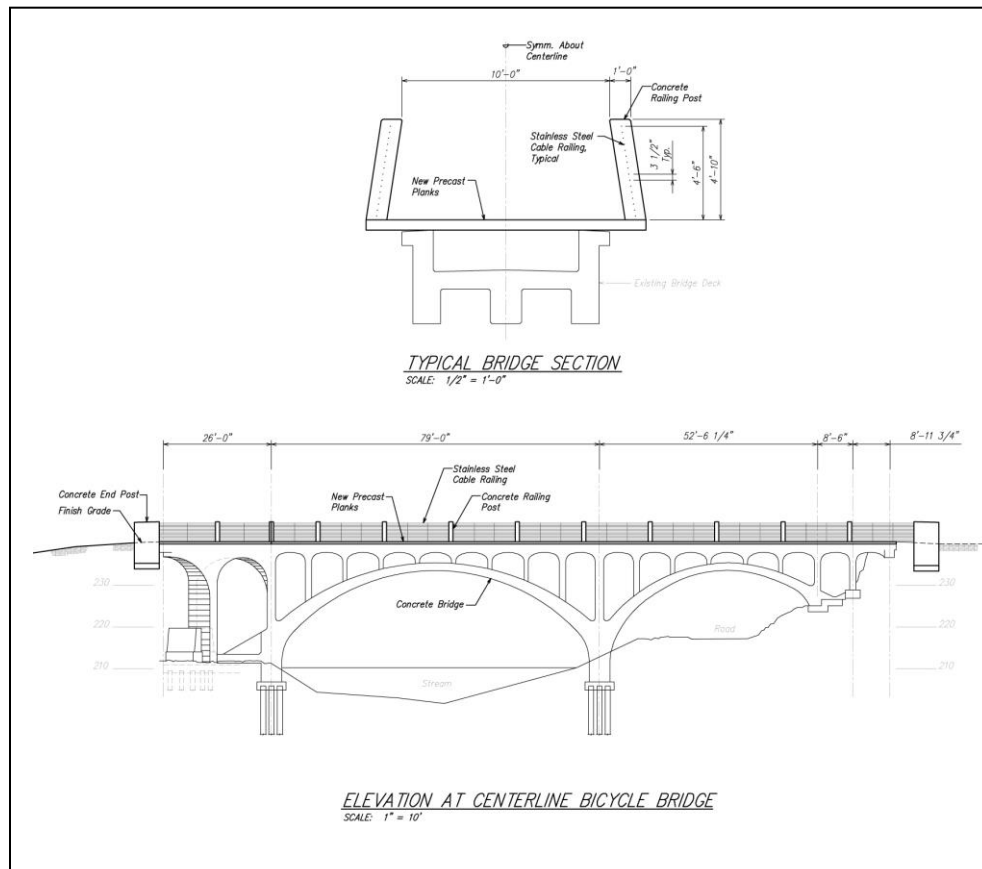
Proposed Hanama‘ulu Bridge retrofit
